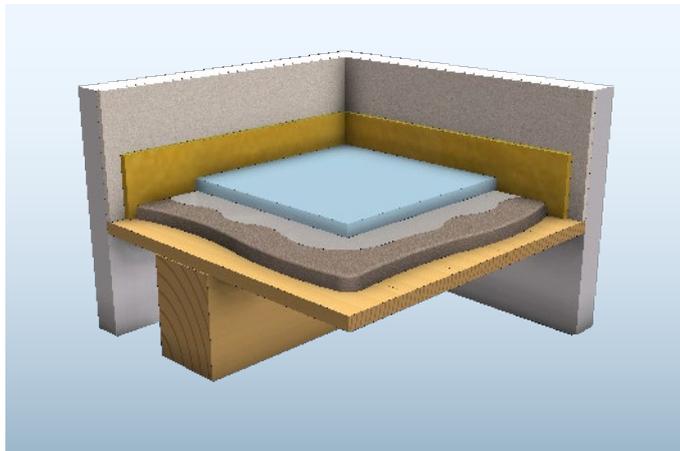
Screed on wood joist ceiling with Knauf EPO-Leicht
